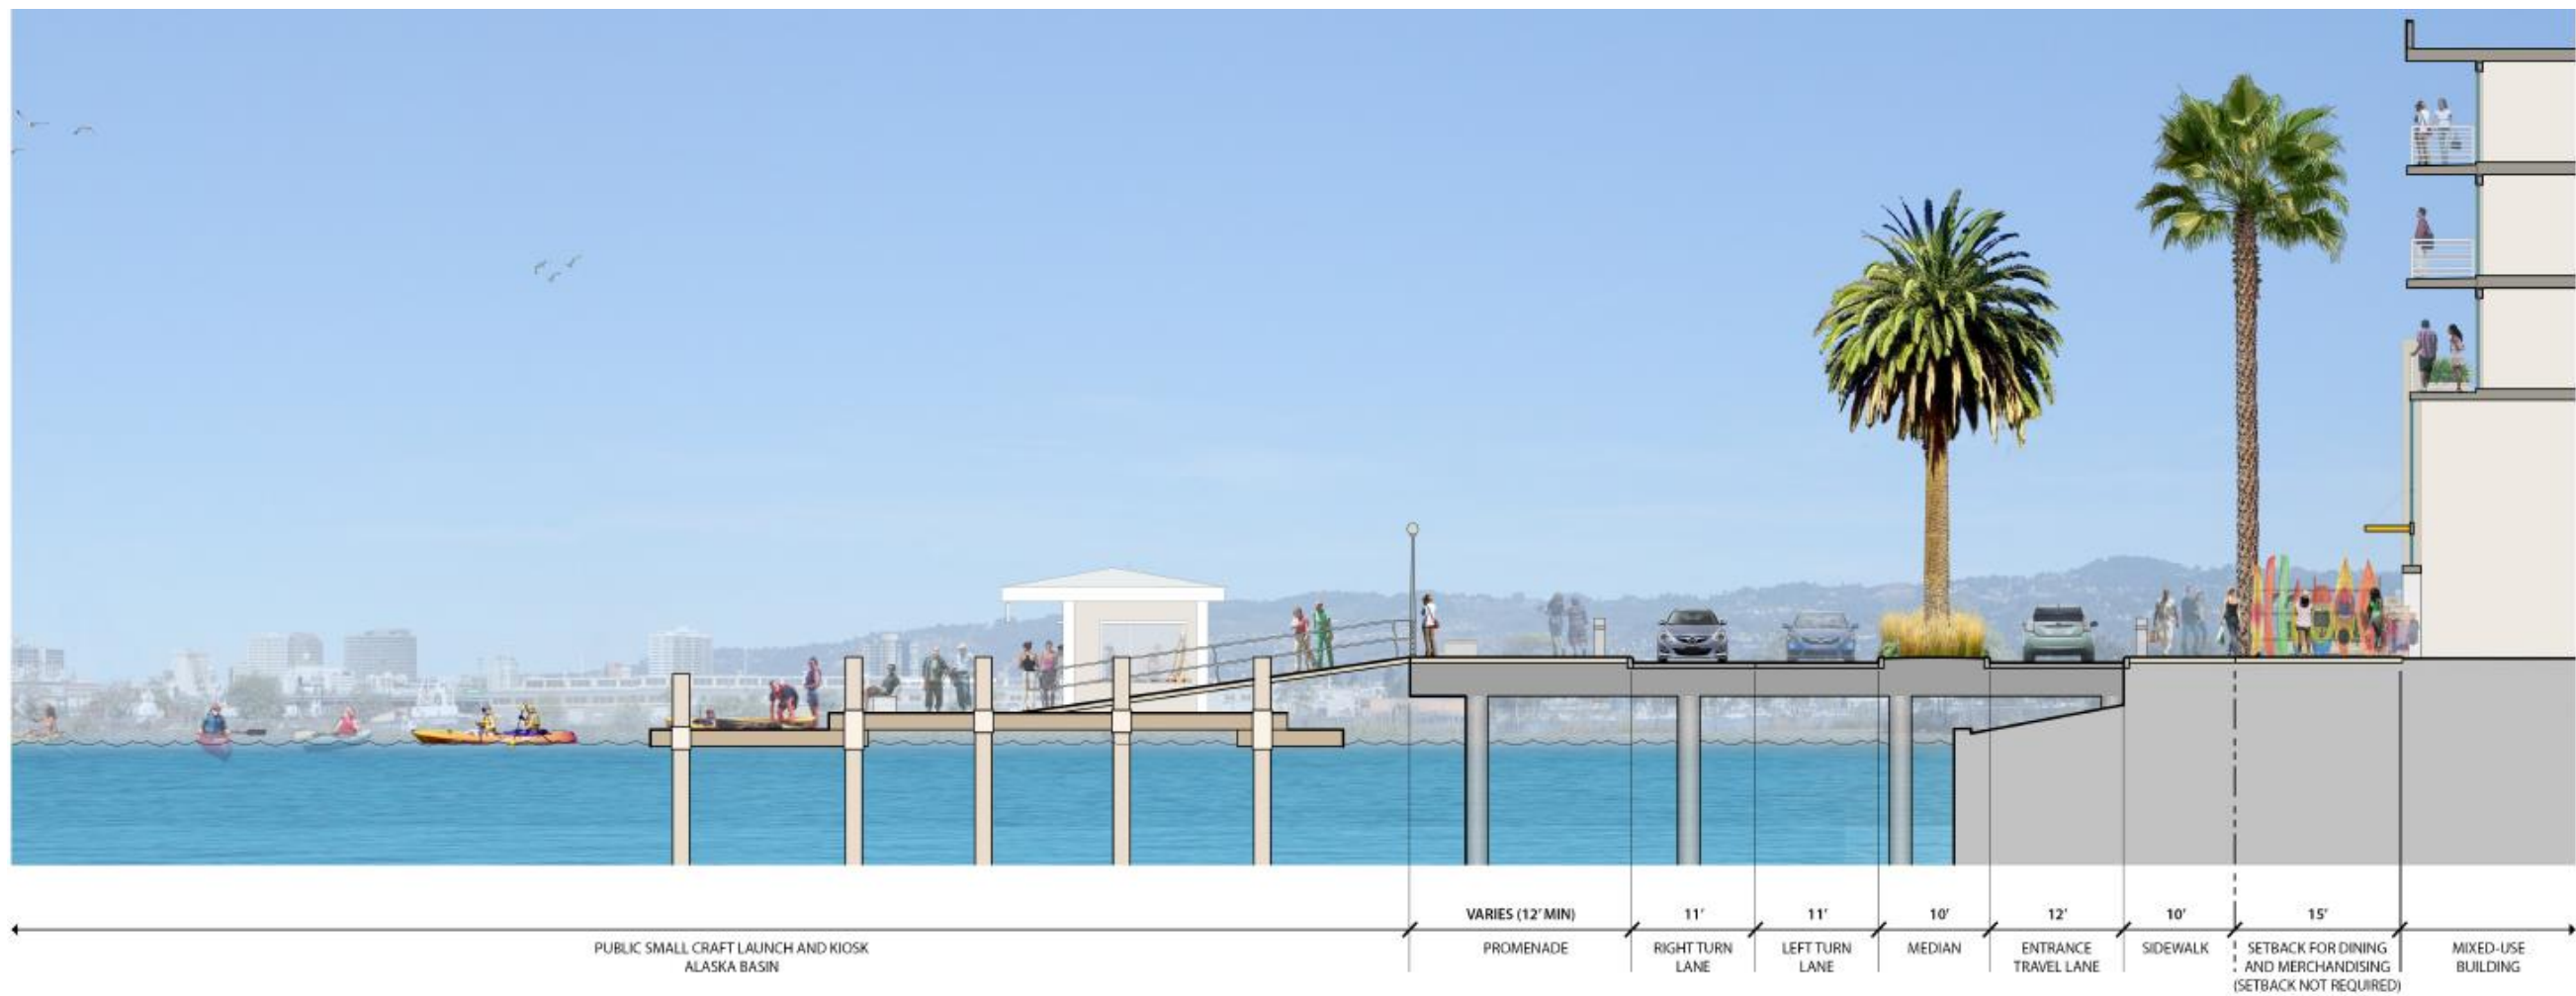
ILLUSTRATIVE CONCEPTUAL CROSS SECTION B: WESTERN ENTRY ROAD AND WATERFRONT PROMENADE AT CLEMENT AVENUE (VIEW NORTH)
